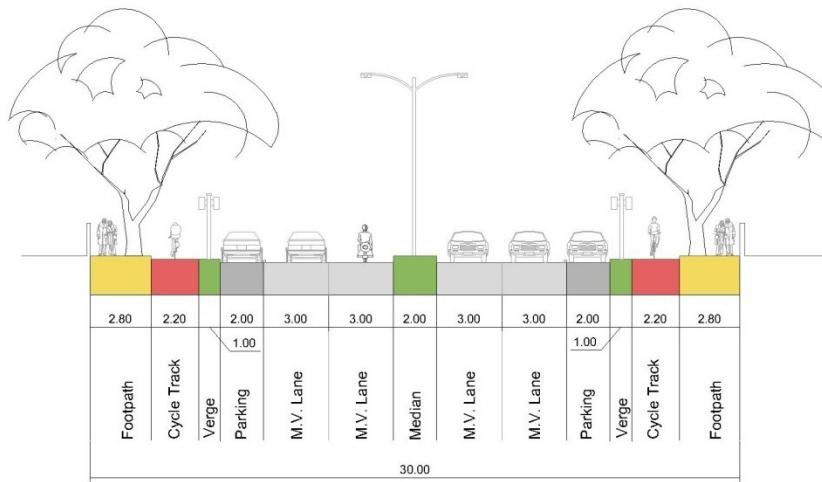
Sub-arterial road at locations with parking (ROW 28 - 32 m.)
